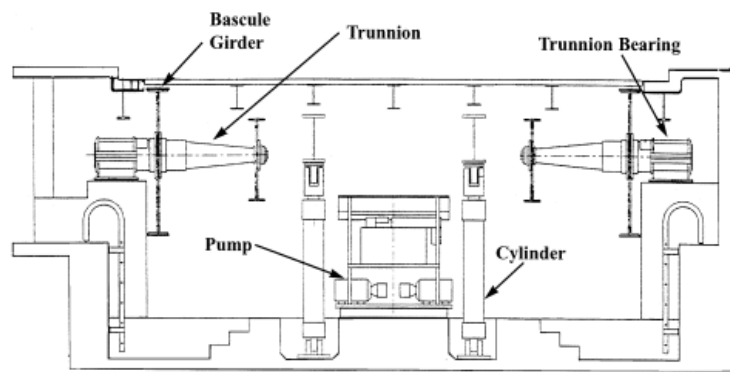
Section of a bascule bridge with hydraulic cylinders mechanism (Abrahams, 2000)
